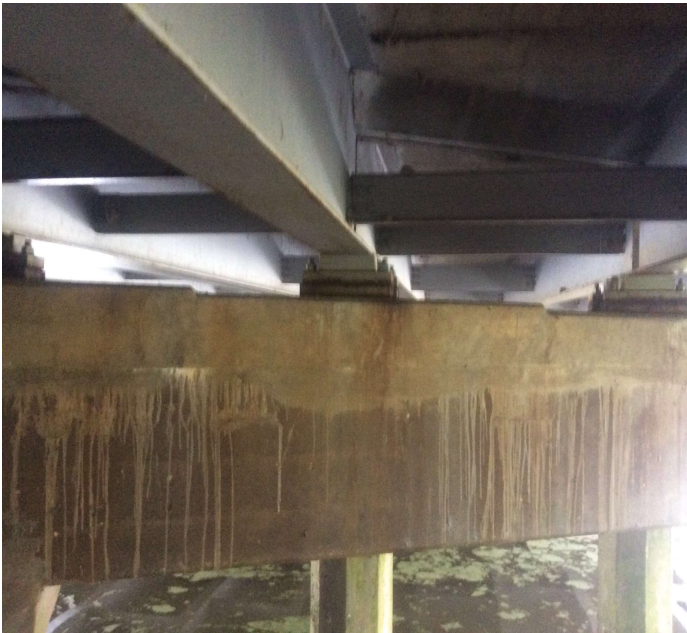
Description      Bent 2 girder 8 bearing has moderate pack rust between masonry plate and bearing
